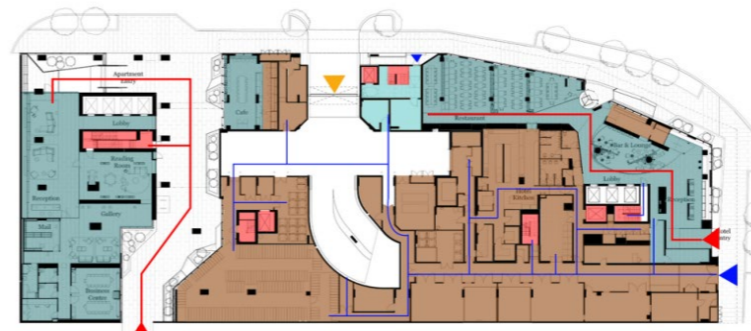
Ground floor plan/ source: ArchDaily.com edited by the author
